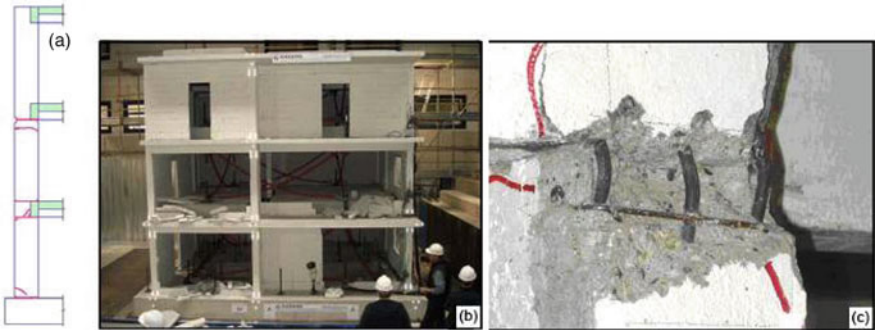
Damage after Test#3 ($PGA = 0.54g$); (a) longitudinal section of Column C2; (b) East view; (c) Spalling of the concrete cover and rebar buckling in Column C2 at 2nd storey
